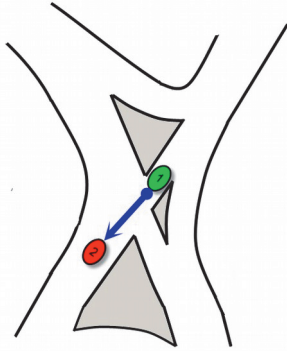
shows Road Intersection 4. This road intersection has 2 incoming traffic sections and 1 outgoing traffic section.
